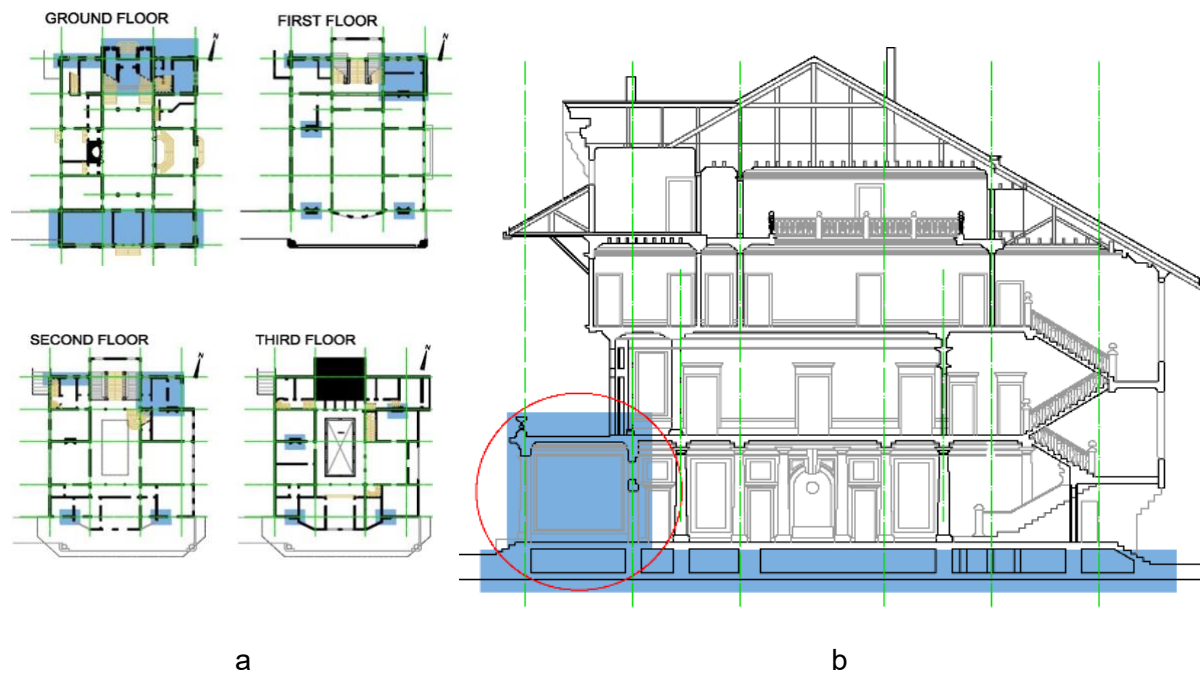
(a) Floor plans showing masonry in blue, (b) Structural system axis is continuous on the section; damaged parts are indicated by red color
